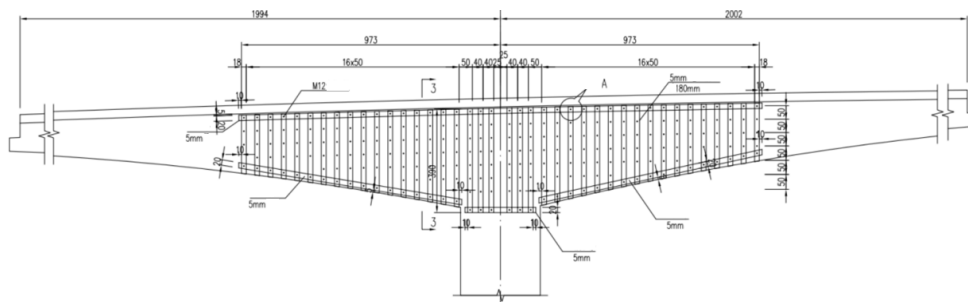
Diagram of Steel Plate Pasting Reinforcement.
